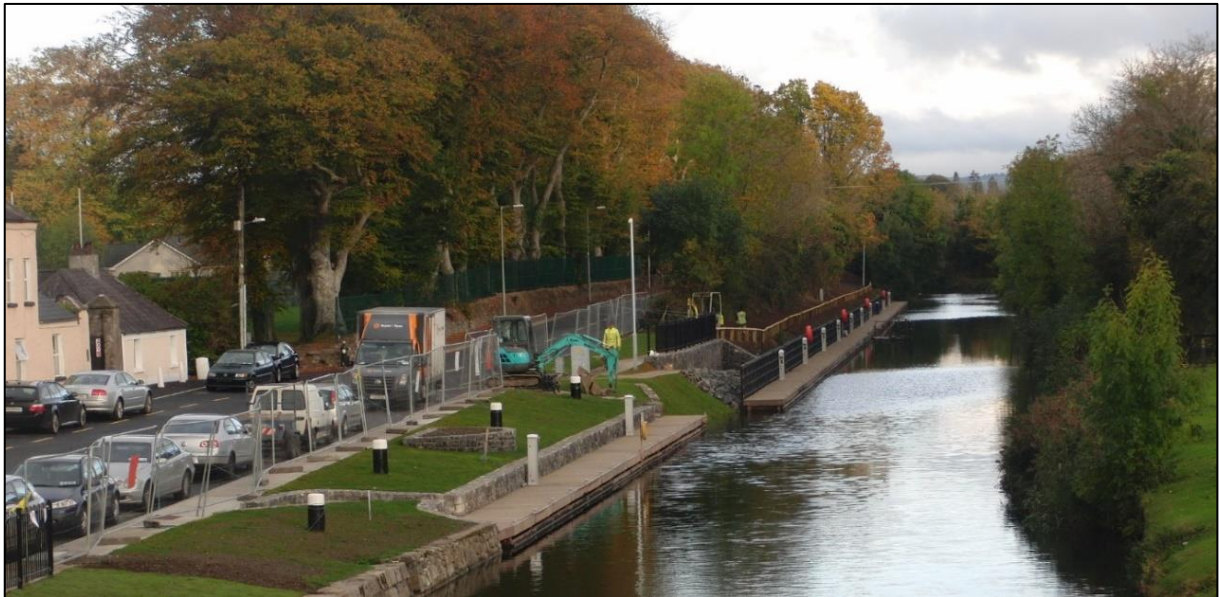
Houseboat jetties at Sallins – Linear jetty along one side of the canal
